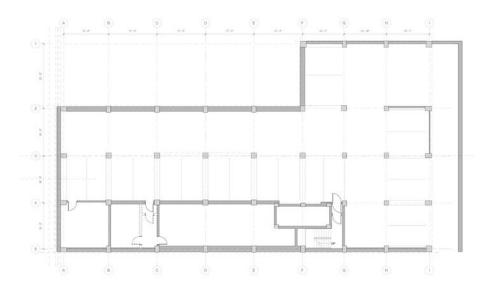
Underground Parking Plan of 1522 K St. N.W. D.C. Source: Eric Gellman
